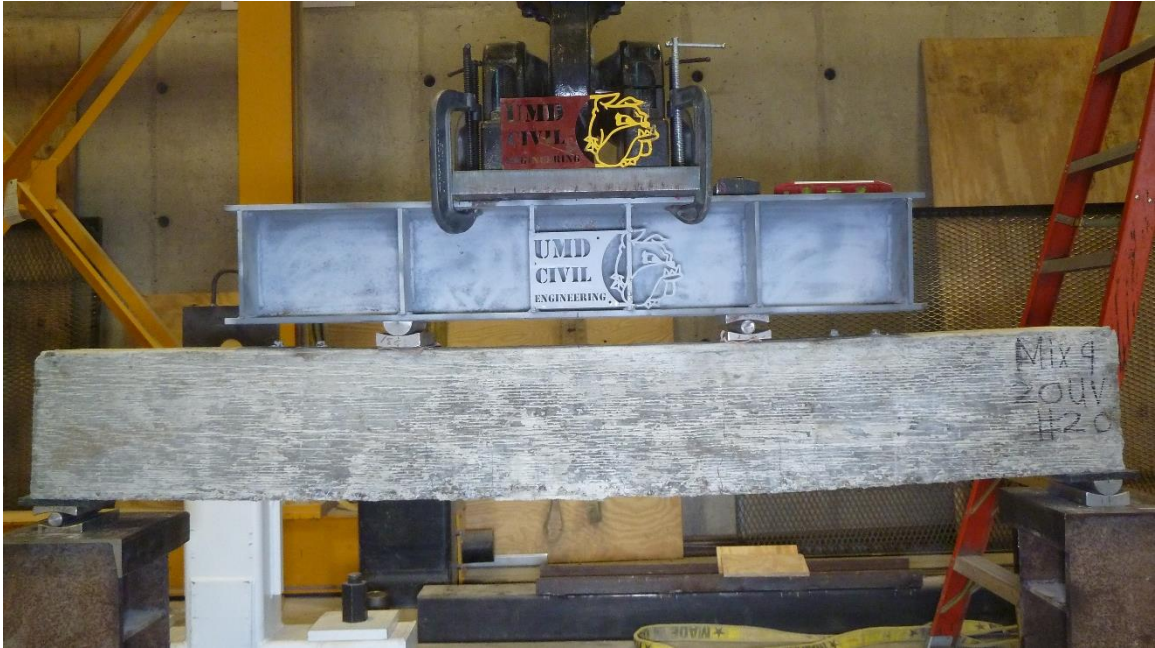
Mixture 8 (20UV) beam #20: concrete beam before testing.
